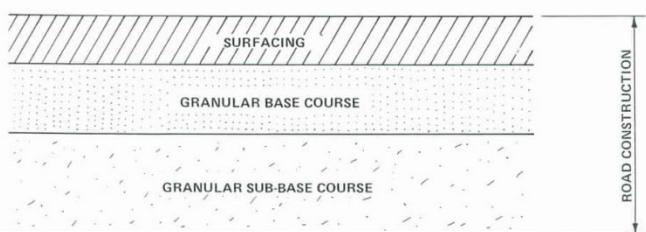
Typical Pavement Structure (Ministry of Transportation Construction Manual)
